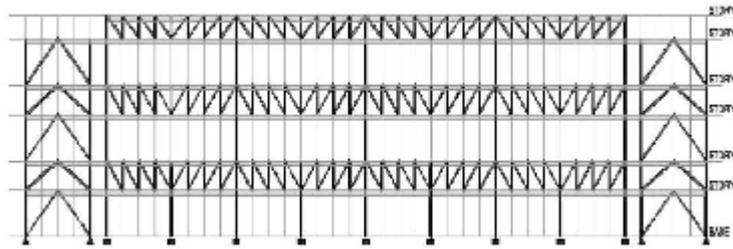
Front Elevation of Structural Blueprint for High-Tech Plant
